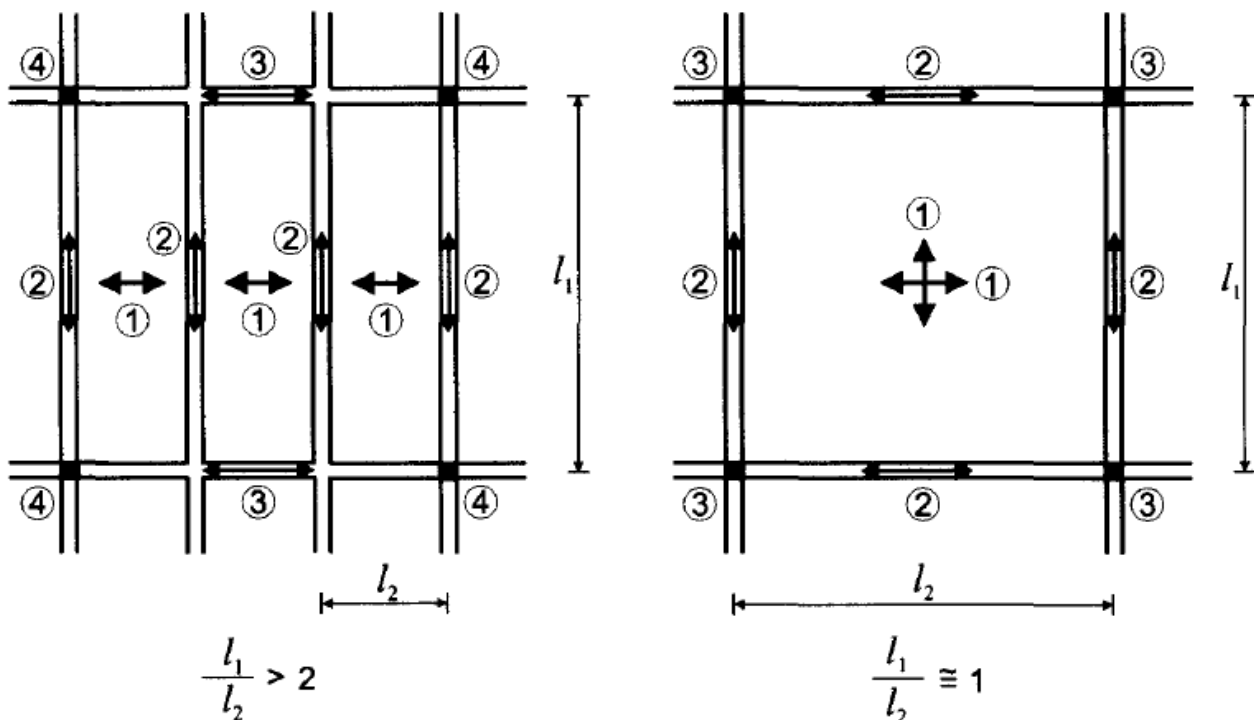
Gravity load path in a floor slab: a) one-way system; b) two-way system.
